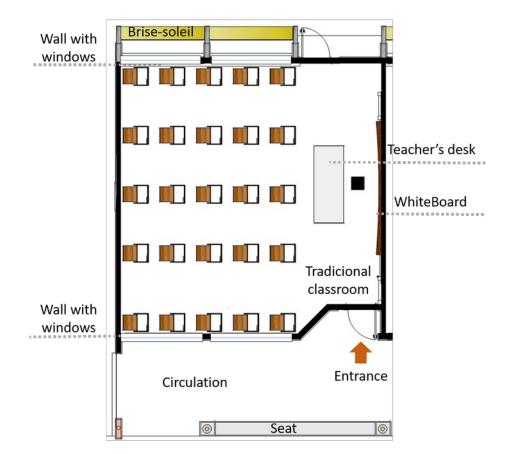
A floor plan of the classroom (FNDE, 2020, adapted by authors).
